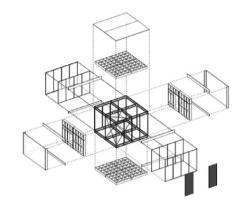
The assembly relation between facade, infill, foundation, roof, and structural system. Source: Durmisevic (2019)
